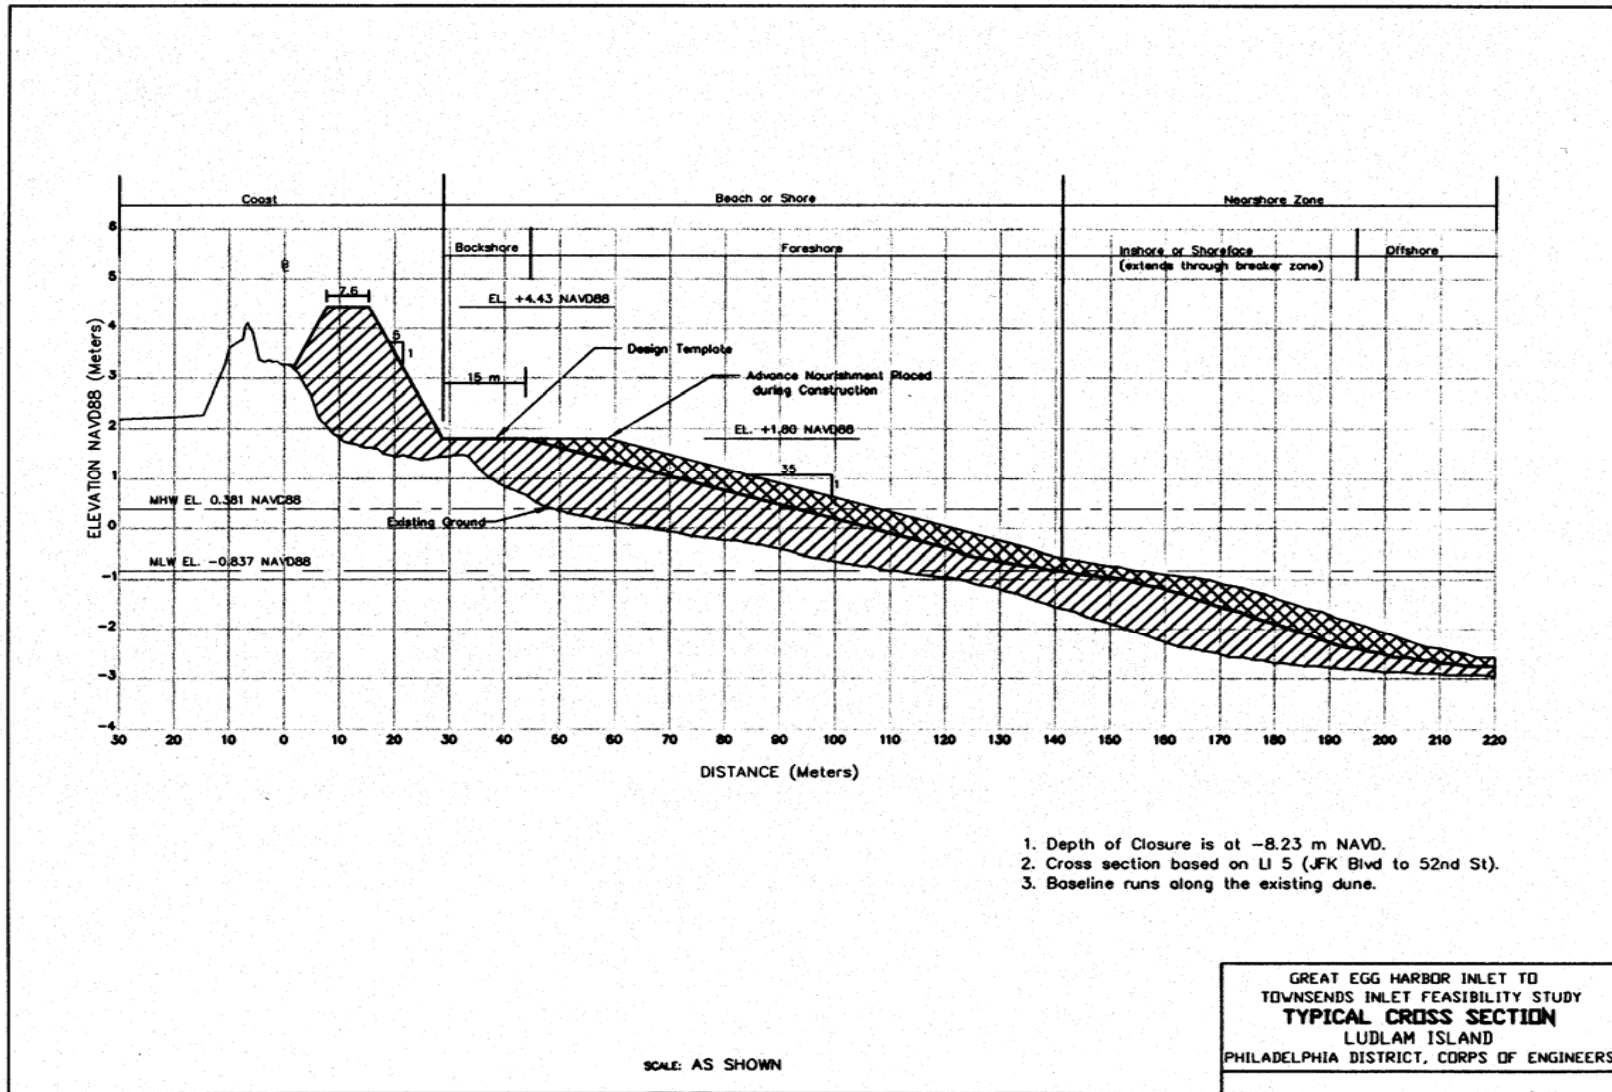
Selected Plan for Ludlam Island, NJ - Typical Design Cross Section
